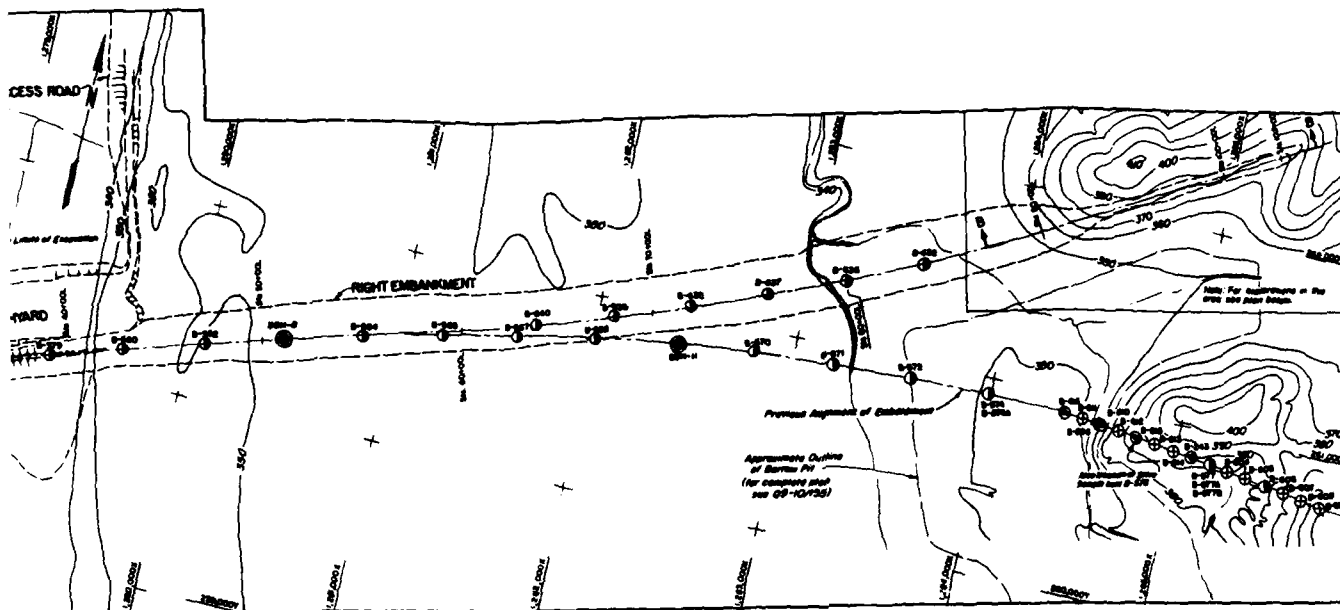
DETAIL PLAN OF EAST ABUTMENT EXPLORATIONS
